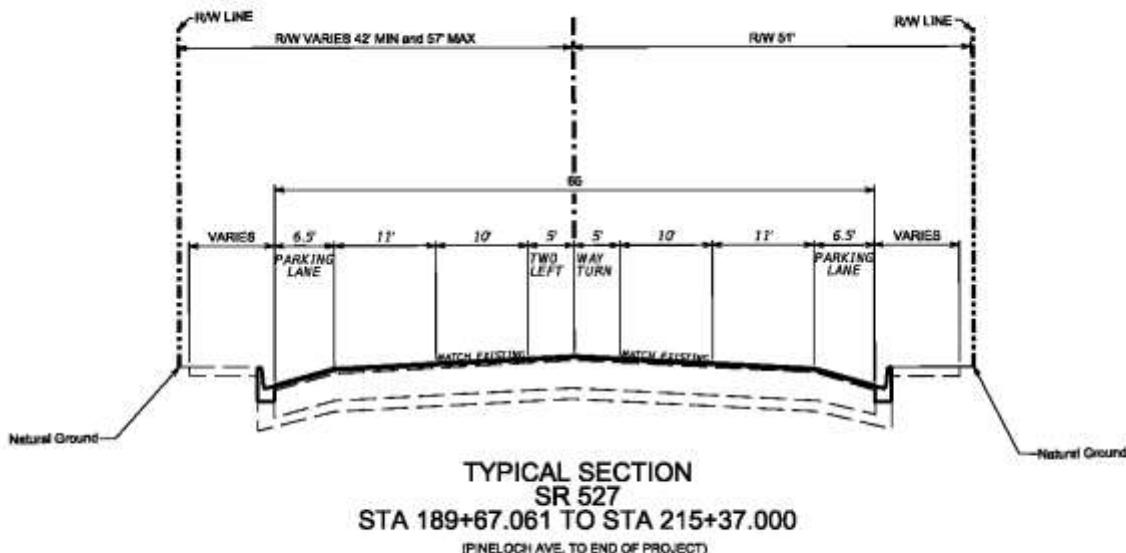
FDOT Typical Section of Orange Avenue from Pineloch Avenue to Gore Street
